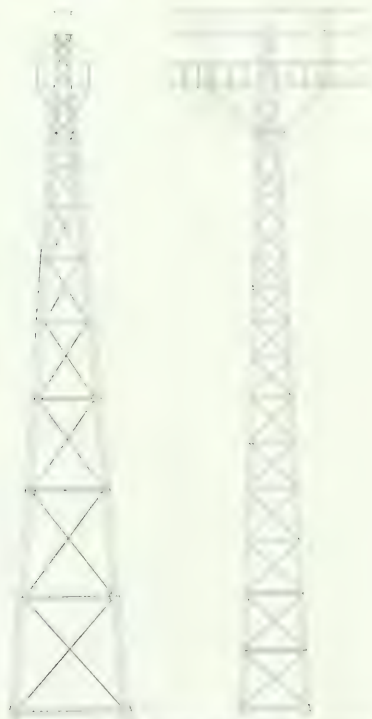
SIDE AND FRONT ELEVATIONS OF TOWER.
